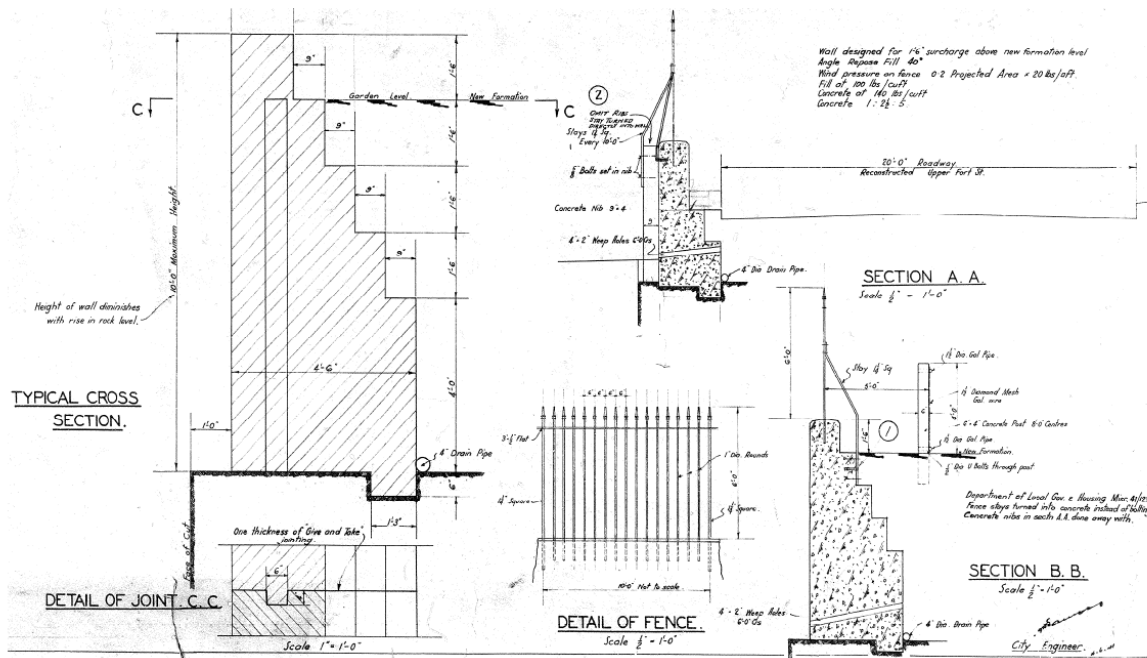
Portion of a drawing detailing the perimeter fencing around the road excavation, documented by the City of Sydney and dated 4 June 1941. (Source: City of Sydney Archives Series 466, item E3-38/28)
